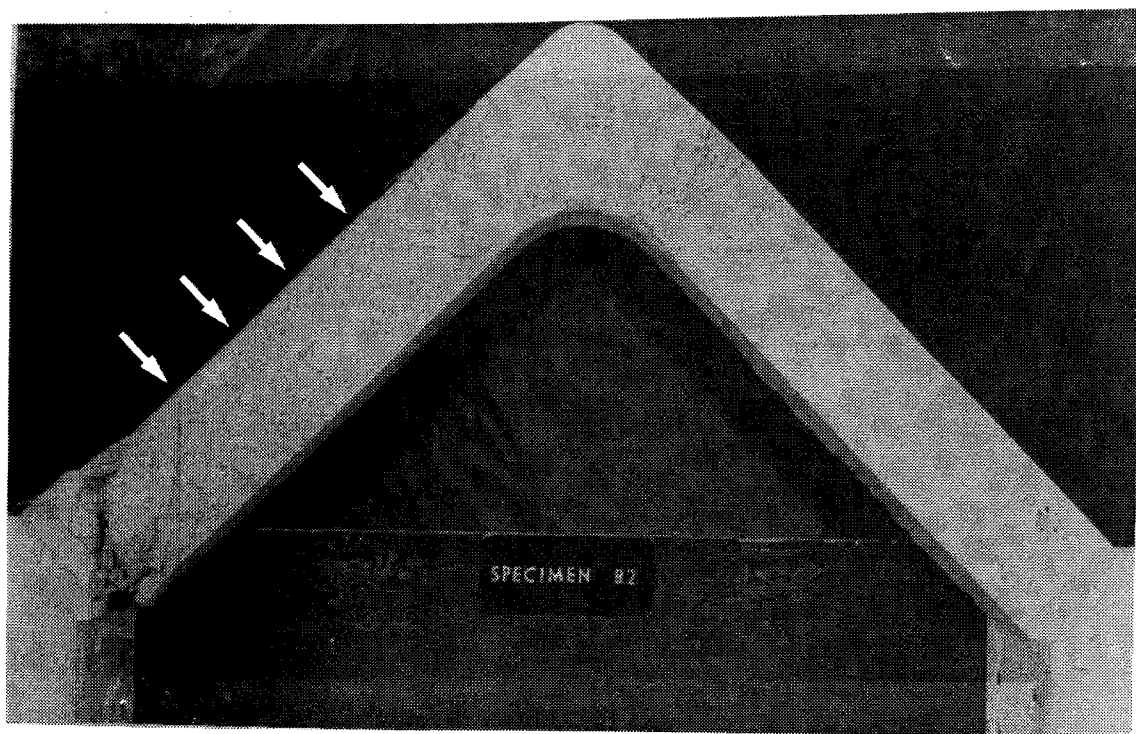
Final Overall Crack Pattern for Specimen B2
